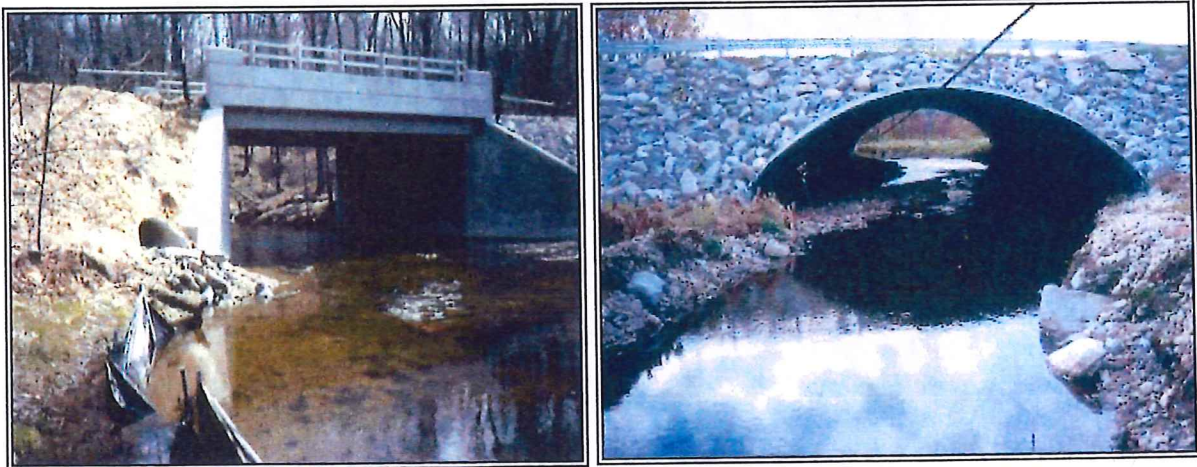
Clear span bridges and bottomless arch culverts are preferred stream crossing structures.
